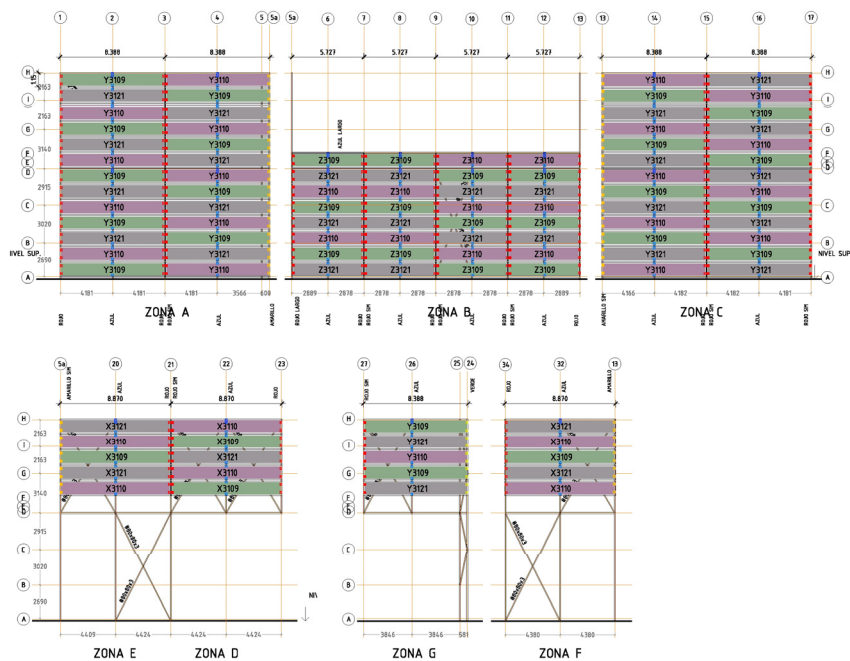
Façade installation plan. Each frame had specific colour and sizes codes, and hanging clamps type
